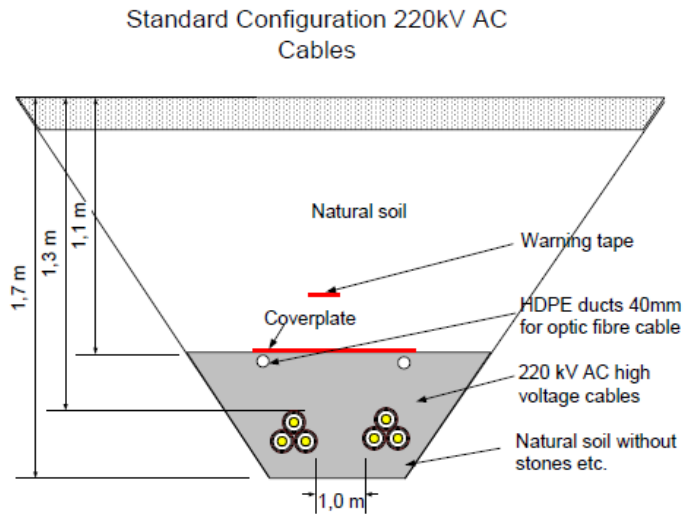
Cross view typical 220 kV AC cable trench Eemshaven
